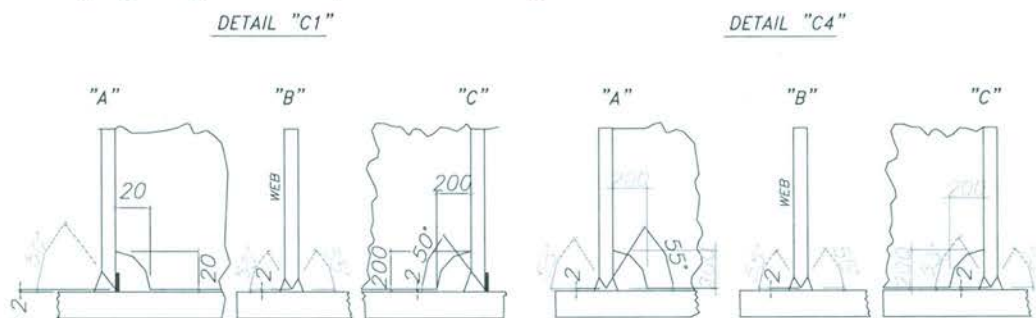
Welding details of the steel beam-to-column joints.
